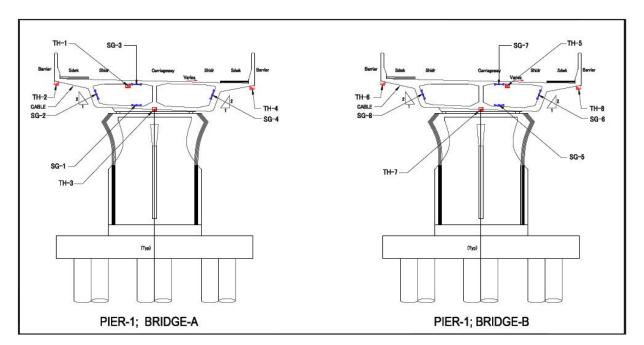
Typical layout plan of strain gage and temperature sensor installation on the bridge
